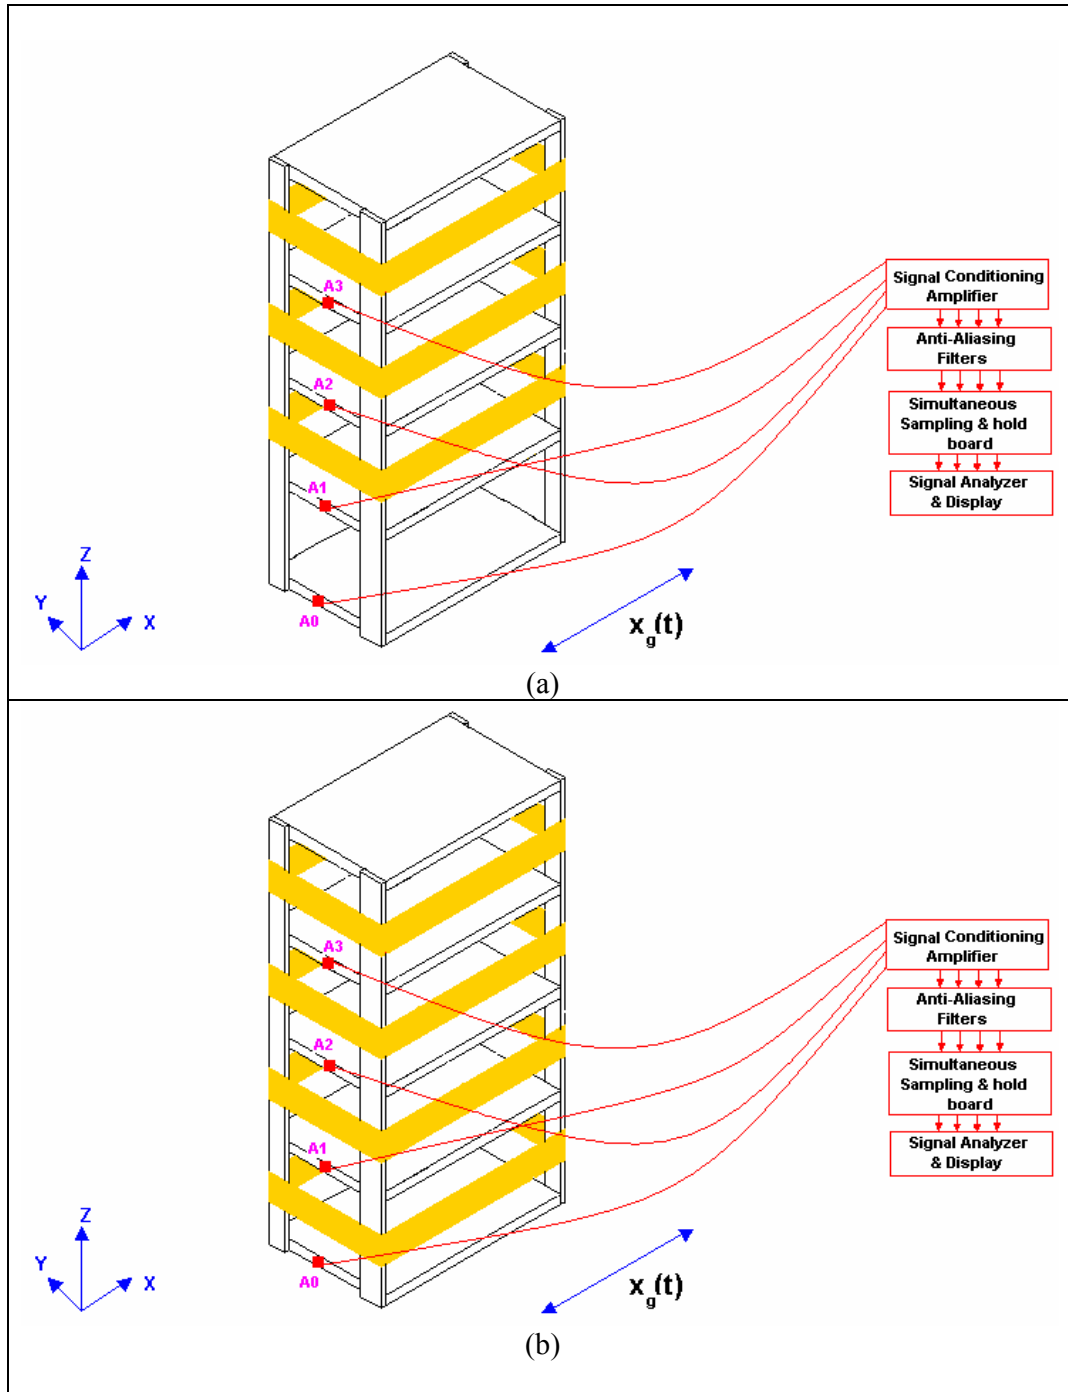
Setup for harmonic base motion test (a) frame with open ground floor; (b) frame with closed ground floor.
